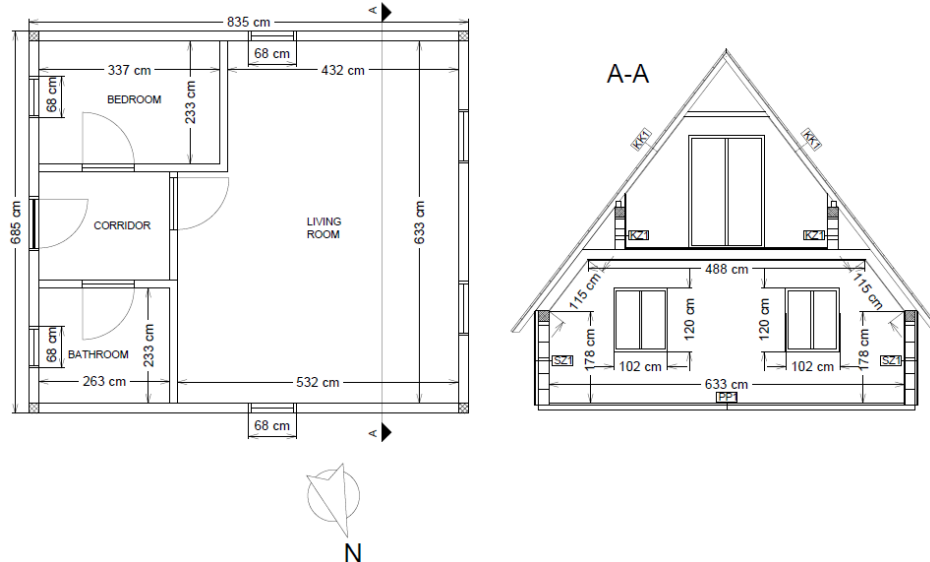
Ground floor plan and vertical section A-A of the weekend cottage
